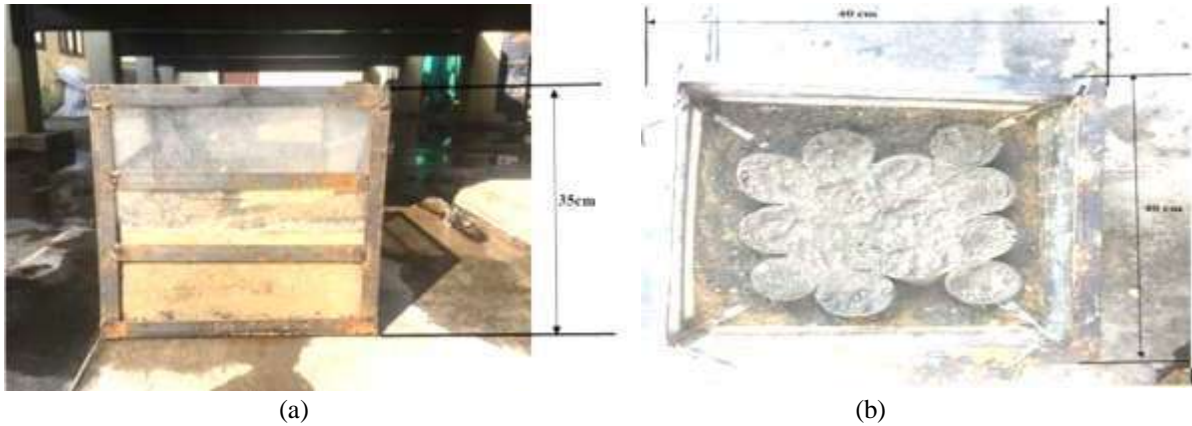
Dimensions of model box 40 cm x 40 cm x 35 cm. Above figures showing elevation and plan (a), (b)
